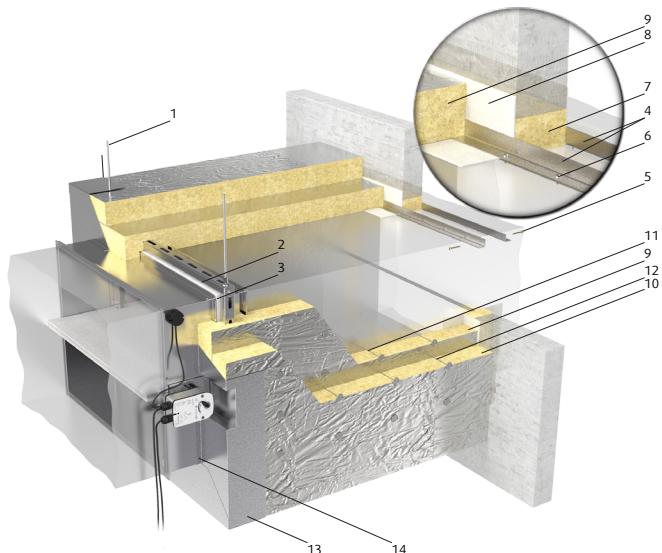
Installation of a rectangular fire damper PKIS on a wall and out of a wall
